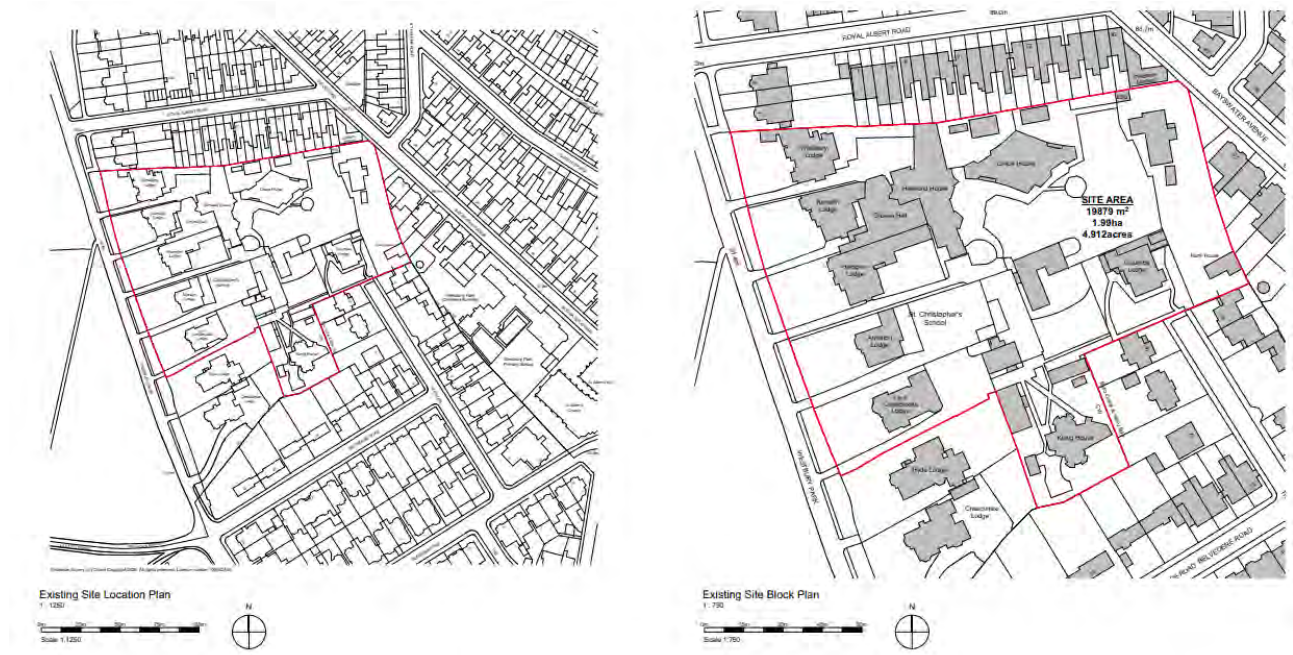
Site location and existing site block plan as submitted by applicant under application reference 22/01221/F
